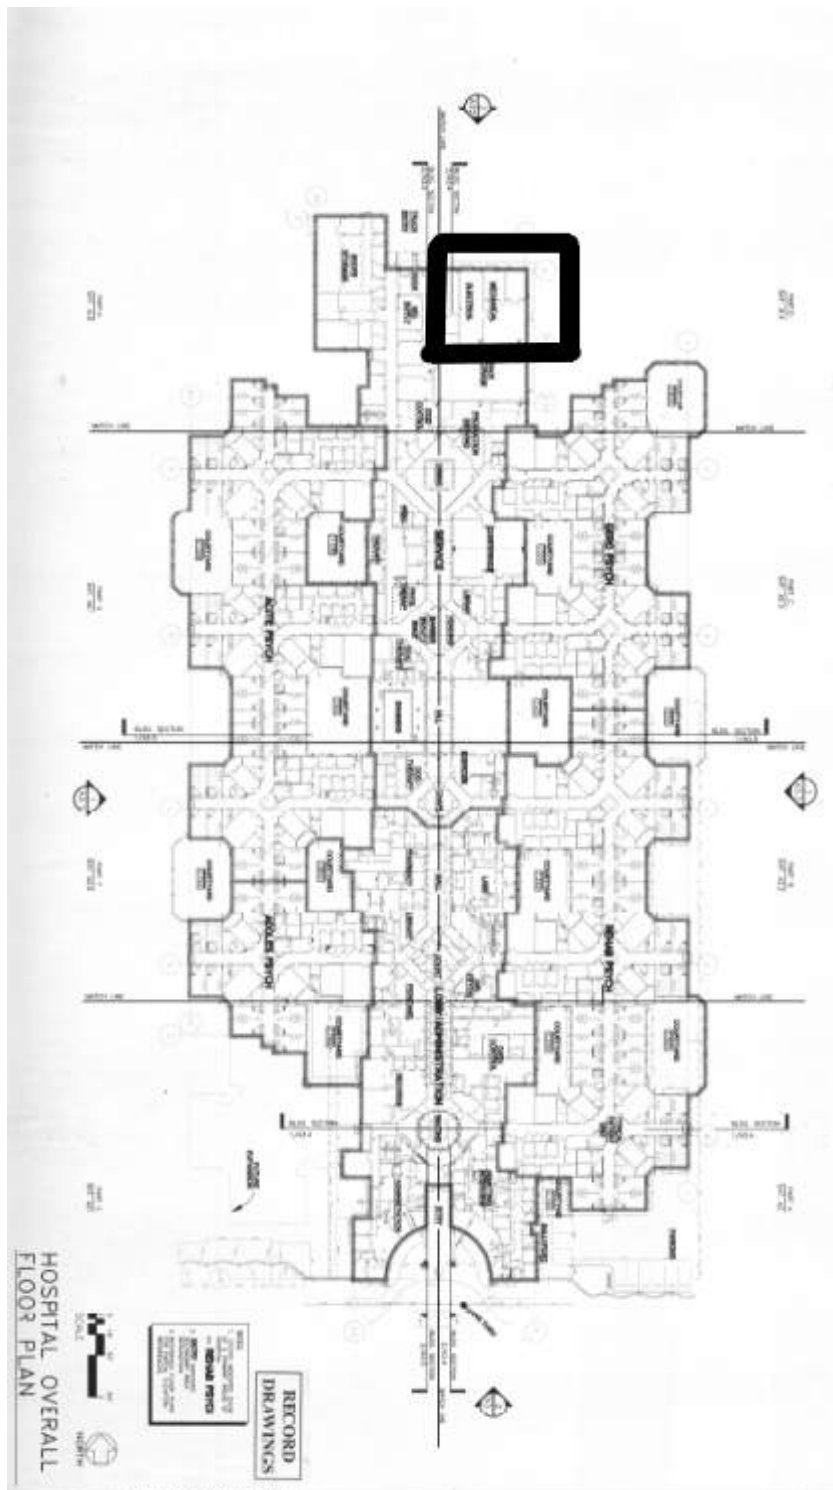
Main Hospital floor plan, with location of Electrical and Generator Rooms shown in the box.
